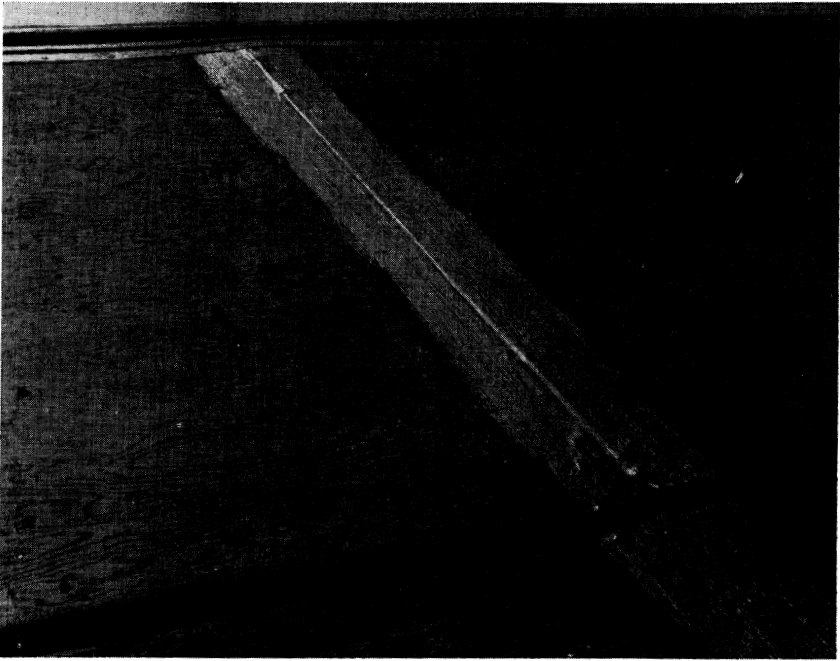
Joint treatment in exposed stressed-skin panel roof. Longitudinal joint formed by overlapping edge of upper panel on lower panel. End joint is sealed with a fabric tape and mastic system.
